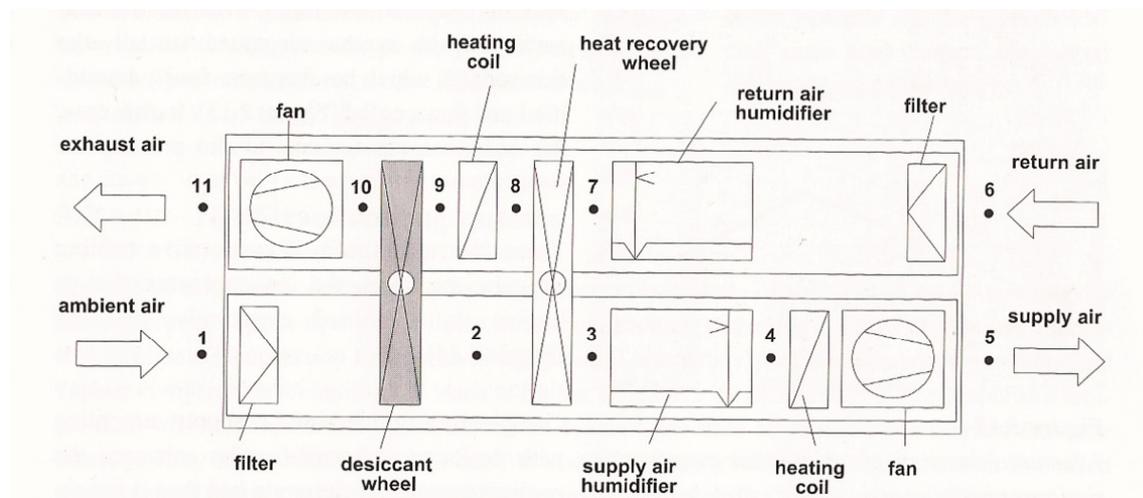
Schematic drawing of a desiccant cooling air-handling unit [8]
